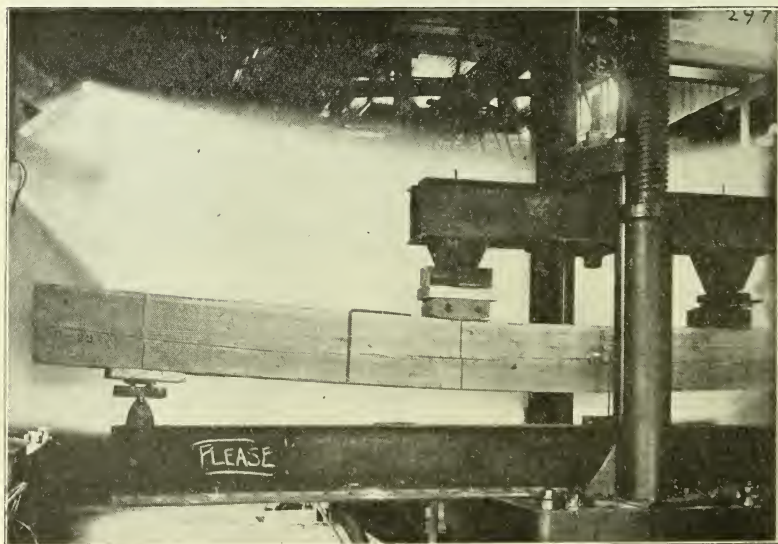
Tamarack bridge stringer under test, showing failure in longitudinal shear.
